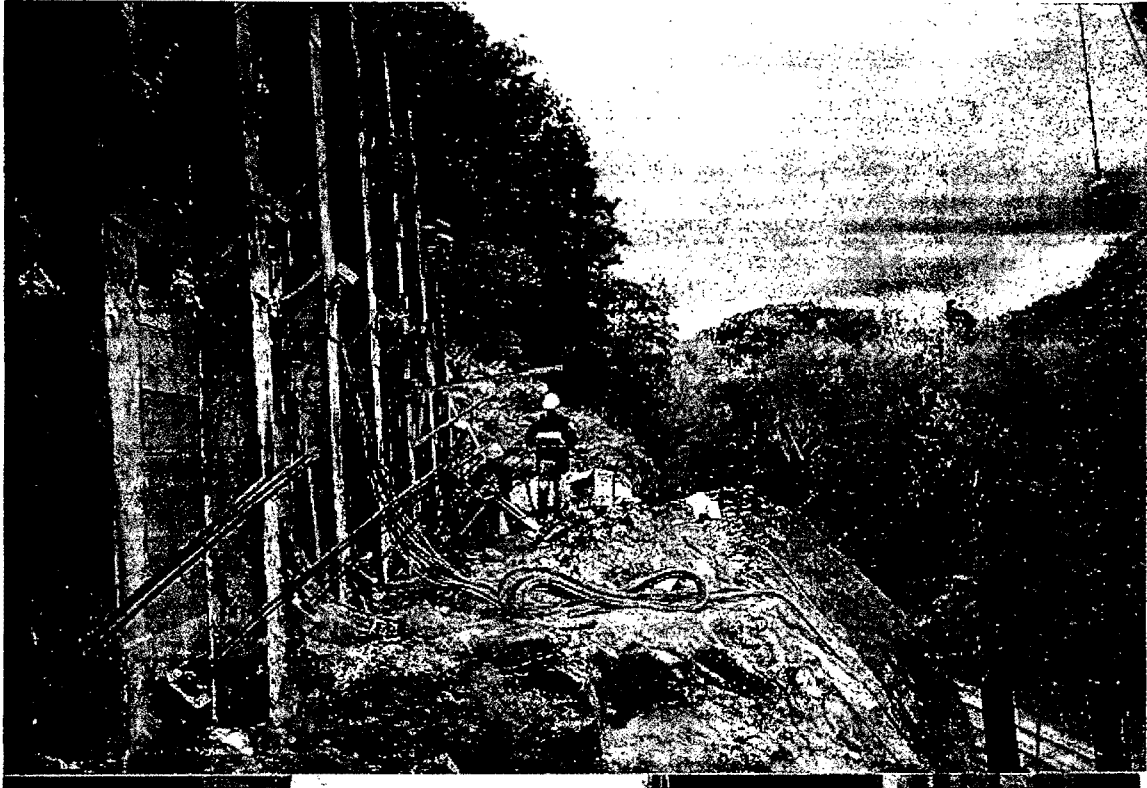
Testing of anchor #30-C in the upper tier wall.
